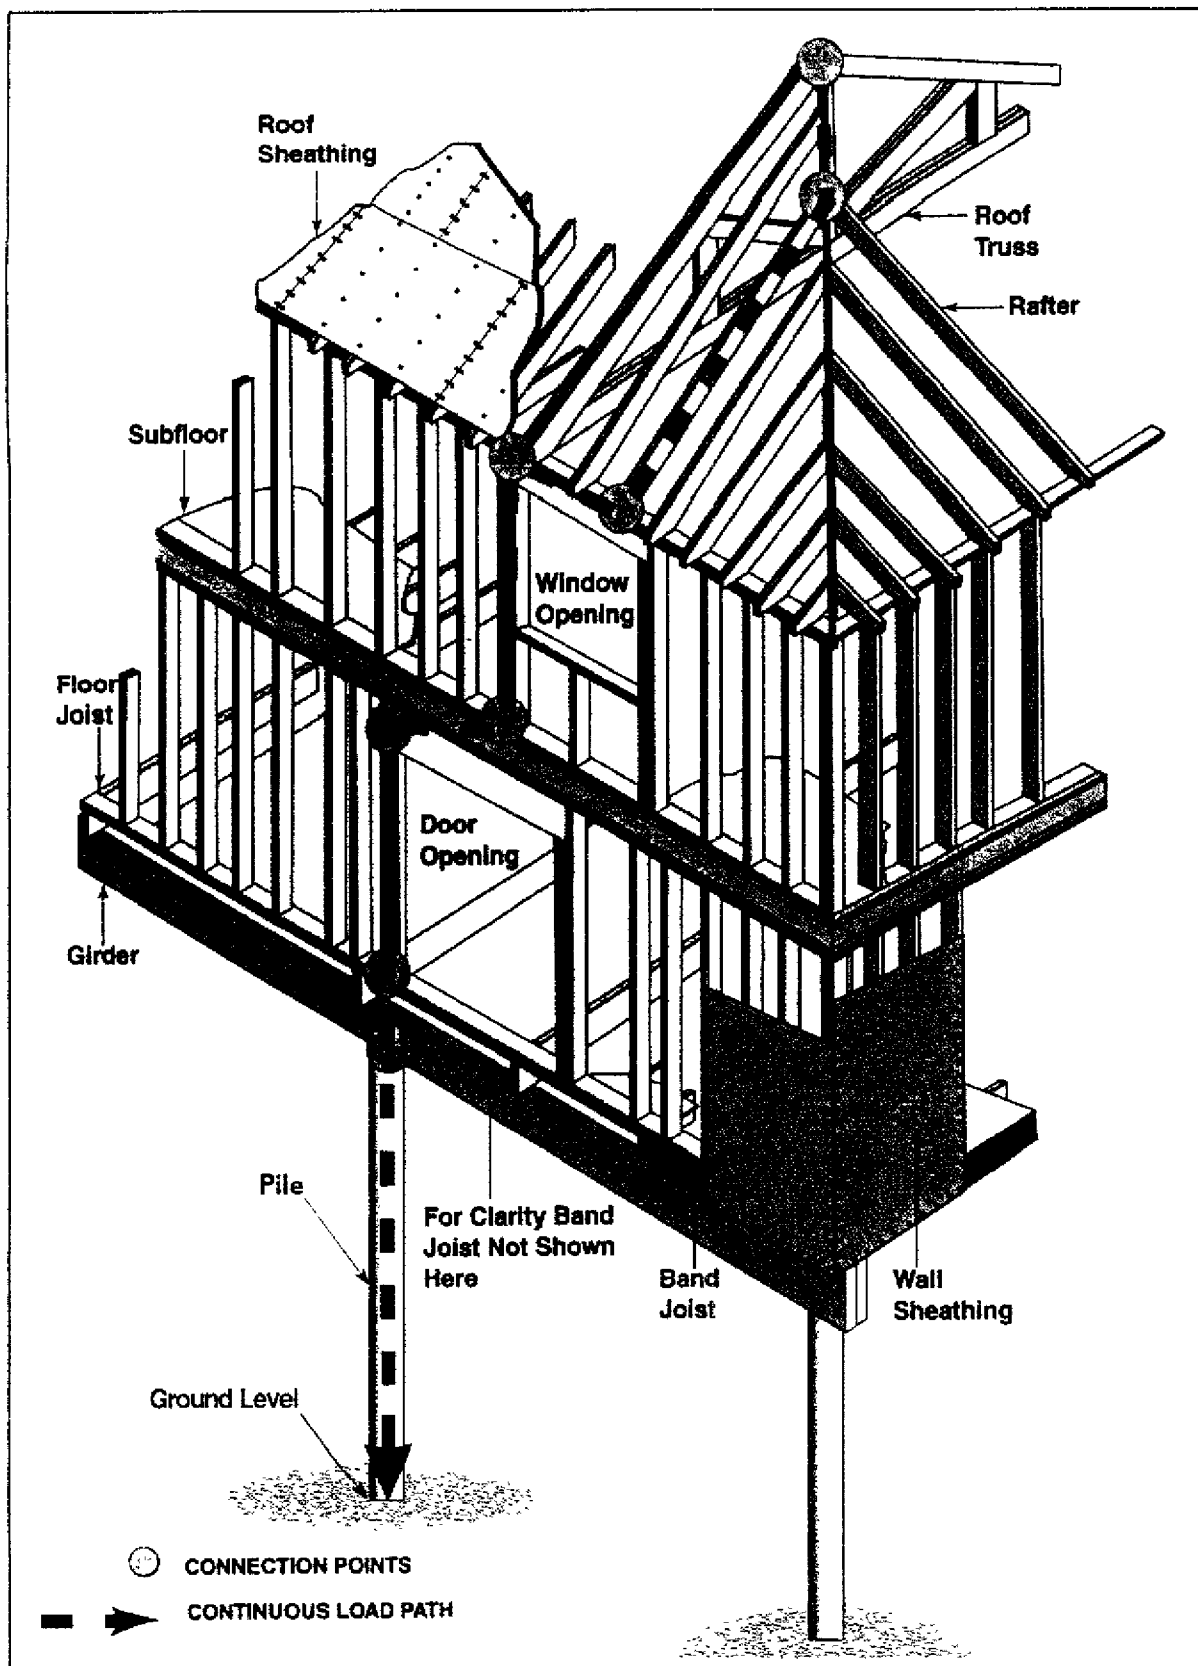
If a building has a continuous load path, forces and loads acting on any portion of the building will be transferred to the foundation of the building. This transfer occurs through building structural members (i.e., columns and beams) and the connections between these members. In this figure, the load path from the roof structure to the foundation is illustrated for an elevated, two-story wood-frame building.
